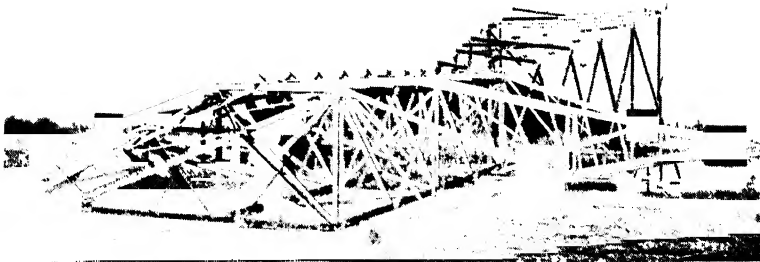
A 132,000-volt transmission-line tower almost completely assembled. Note that the bottom part is being bolted to the subassembly of the top part. This tower is almost complete and ready for erection. The dark square sections of steel shown in the top assembly are the mounts for the insulator strings which carry the line conductors. (Courtesy Wisconsin Electric Power Co.)
